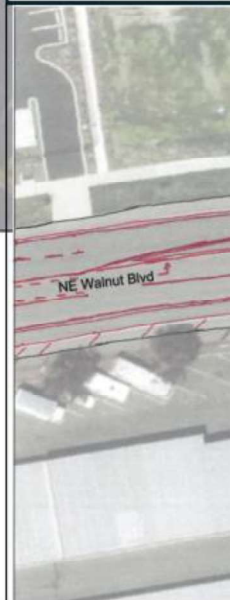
Walnut Boulevard Spot Specific Recommendations – Page 2
